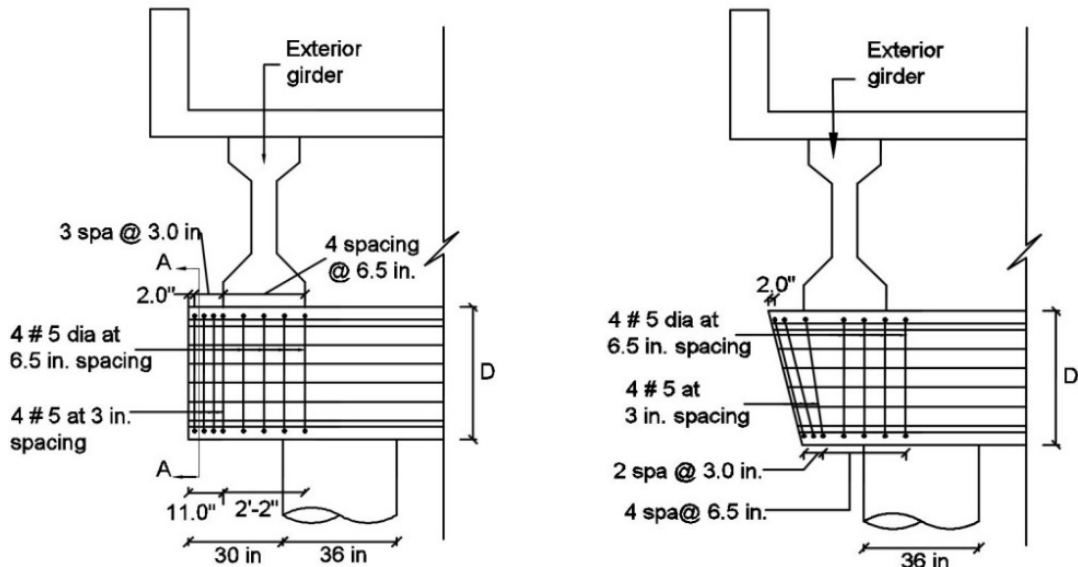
Proposed End Region Detailing Recommendations (Barooah, 2006).
